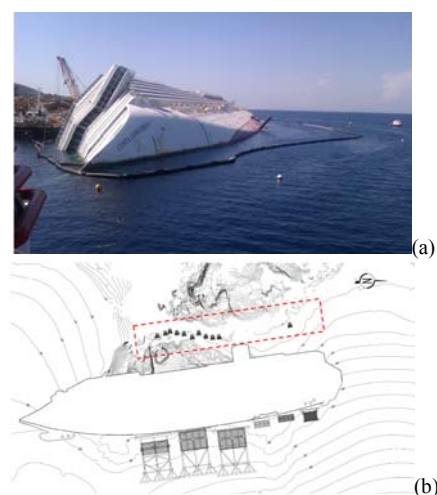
Pictures of Costa Concordia: bow (a) and plan view (b), prior to parbuckling, with the anchor blocks area marked by a red dashed line
